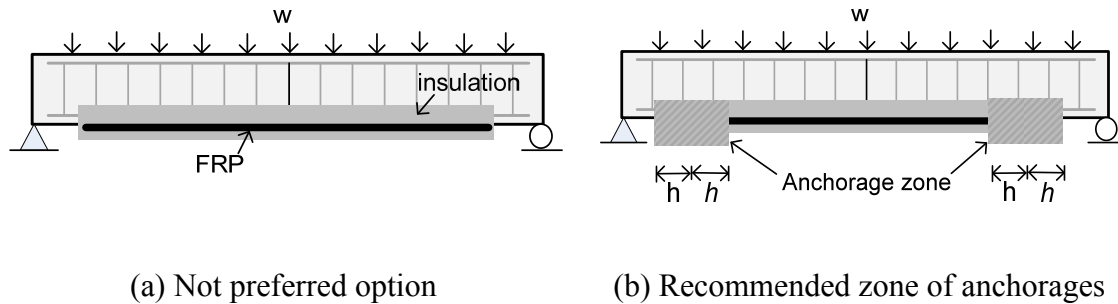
Proposed fire insulation layout for FRP-strengthened RC beams
